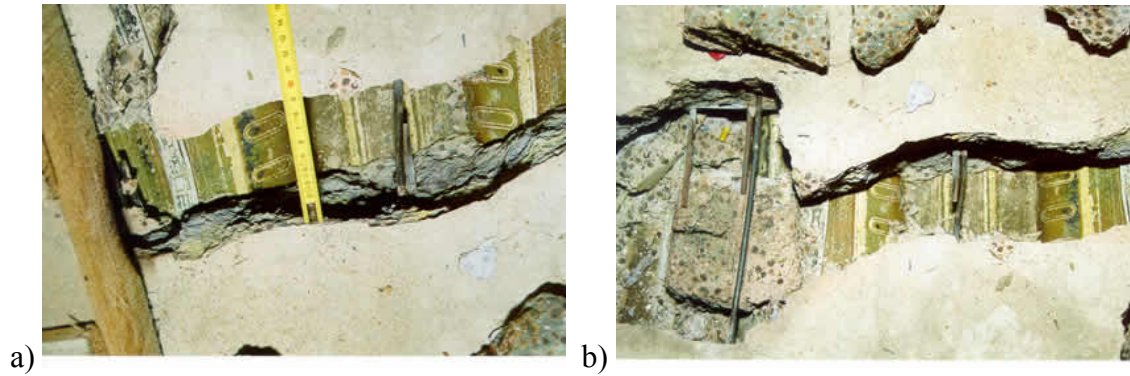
Reinforcement mesh a) slippage and cracking near to the column D2, largest crack/opening in the mid-span
